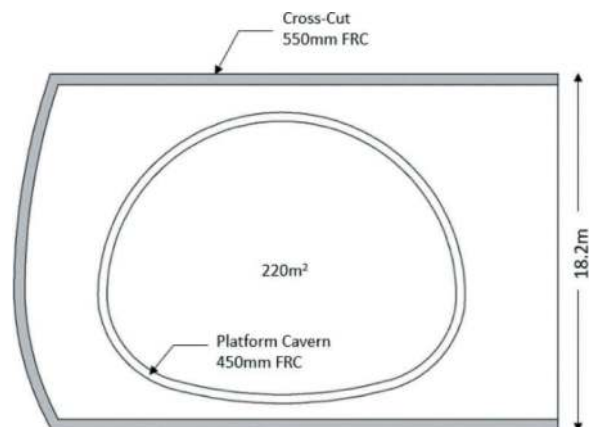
Section along the Cross-Cut tunnels indicating the openings for the Platform Caverns.
